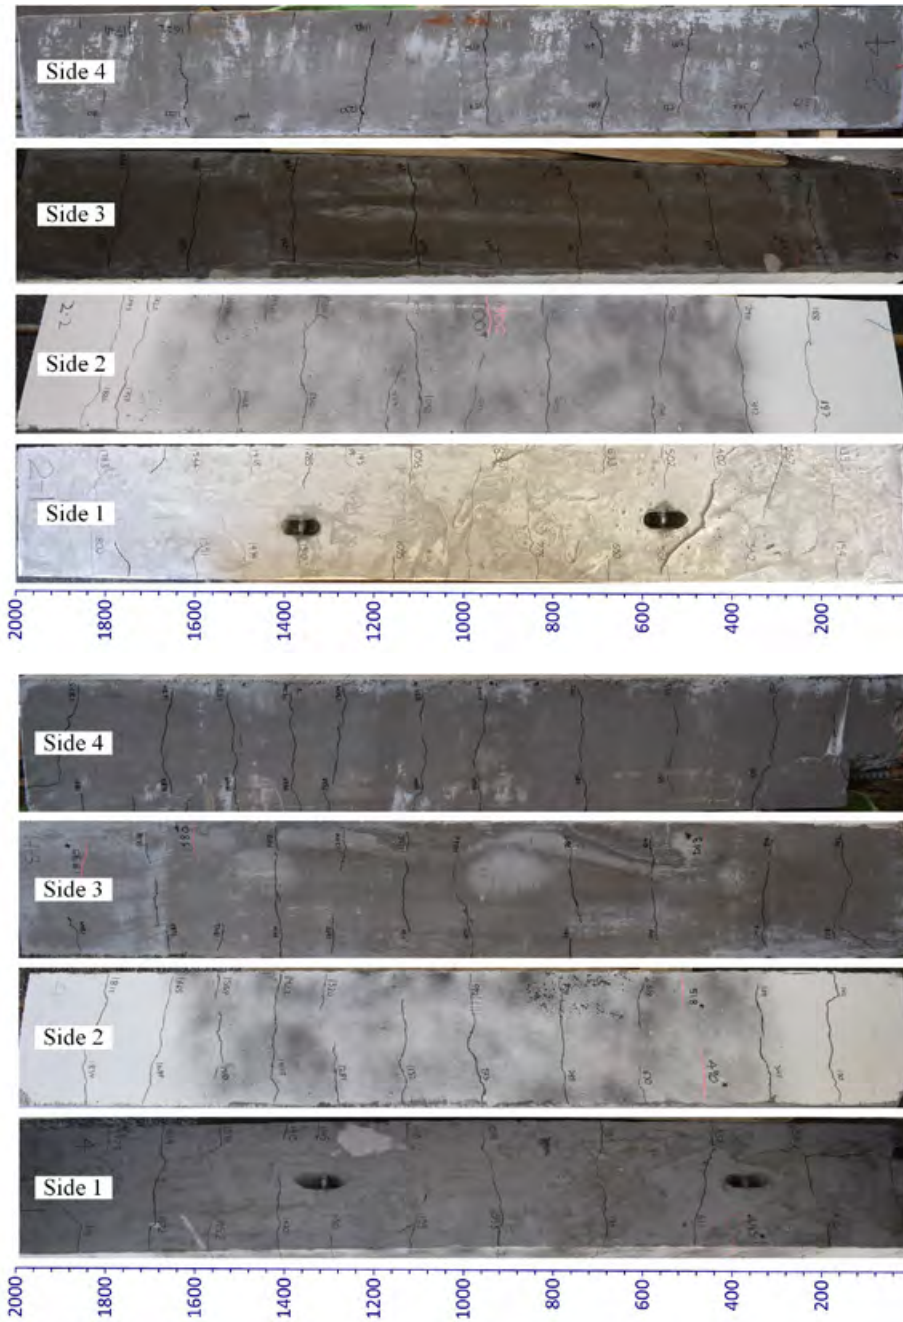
(a). Crack spacings of specimen set 2 (scale is in mm).
